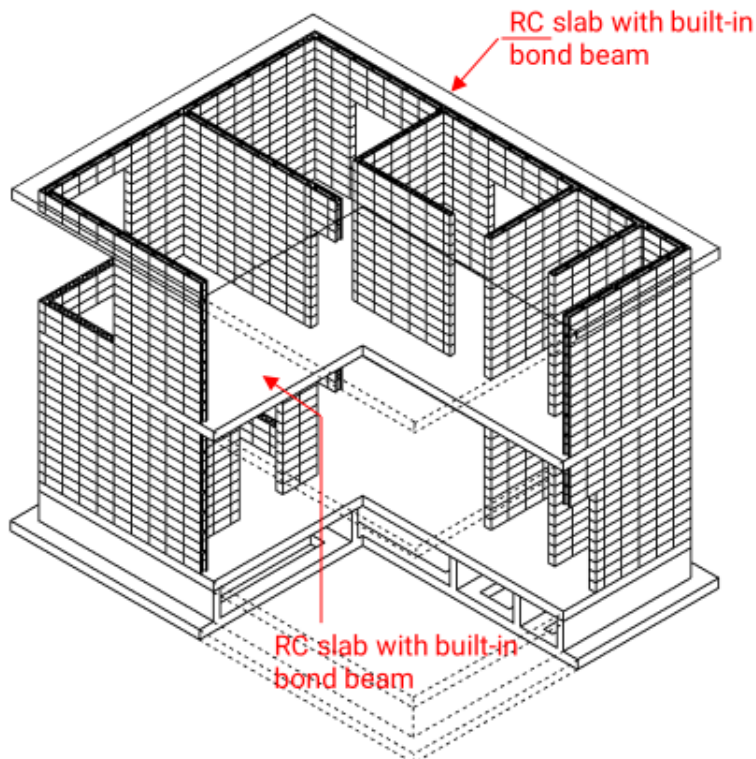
Outline of the proposed load bearing type CHB structure for low-rise buildings.
